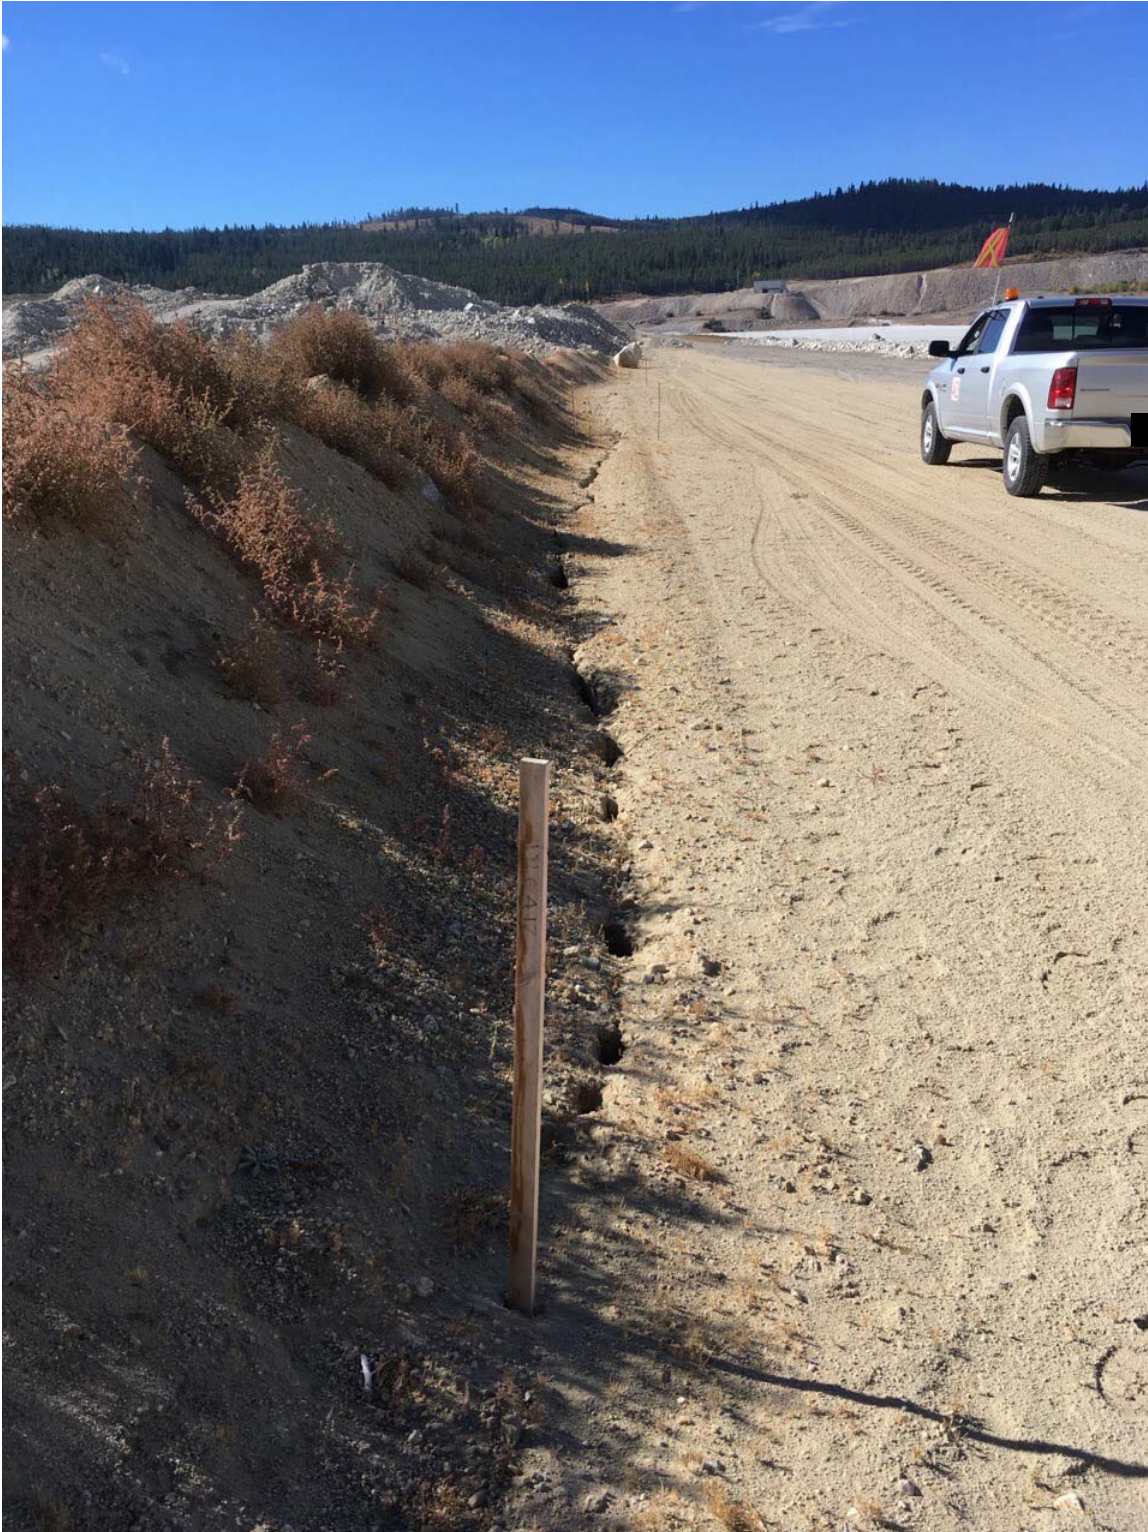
Existing longitudinal crack on downstream edge of SG2 fill zone, with no signs of fresh movement or vertical displacement across crack; crack is >30 cm deep and up to 20 cm wide; hairline crack approx. 1 m upstream of the main crack (HH-2017-07)
